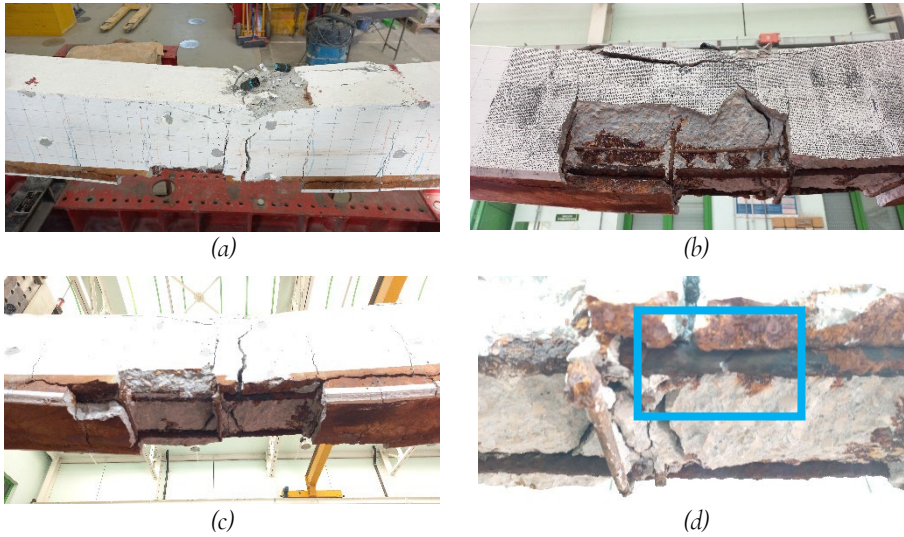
Details of failure condition for specimen RC-C5 (a) Top view with visible signs of the beginning of top cover spalling; (b) View of the side with speckle pattern, with visible spalling of the lateral cover; (c) Bottom view of the beam, with extensive spalling of bottom concrete cover; (d) fractured corroded steel rebar
